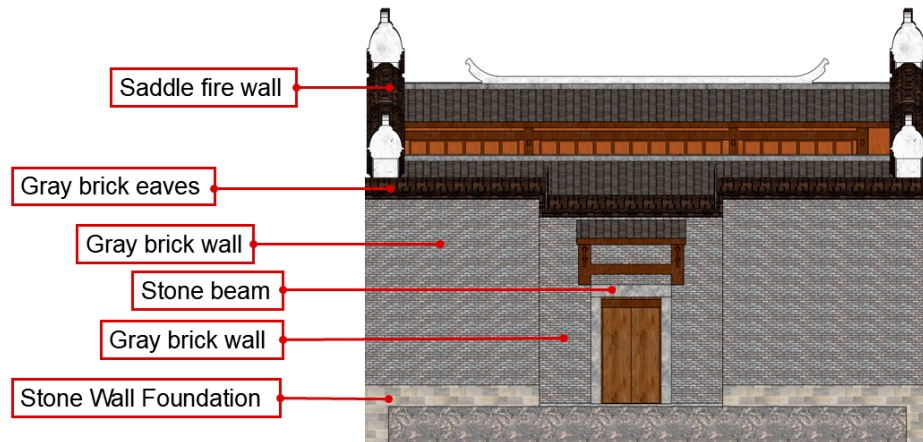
Ancient houses in Fuzhou feature gray brick on their façade (image source: drawn by the author).
